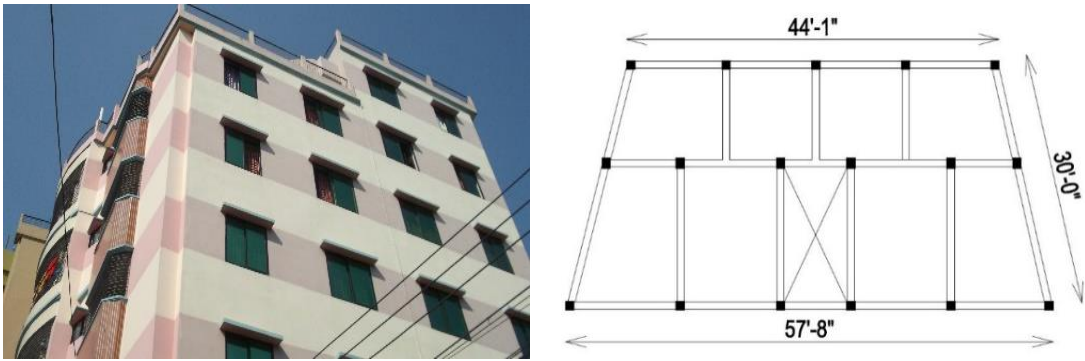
(a) 3D view of the selected building, (b) typical floor plan
